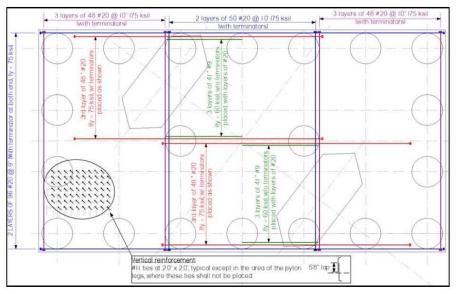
Foundation Cap 1ST, Bottom Mat Reinforcement – Drilled Shaft Layout Schematic Provided by Others
